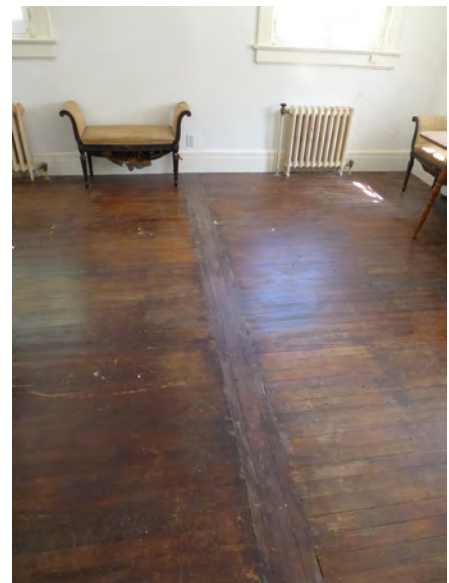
Servant's Bedroom E (223), looking north. Photo shows location of removed wall in floorboards. (HA, 2015)
